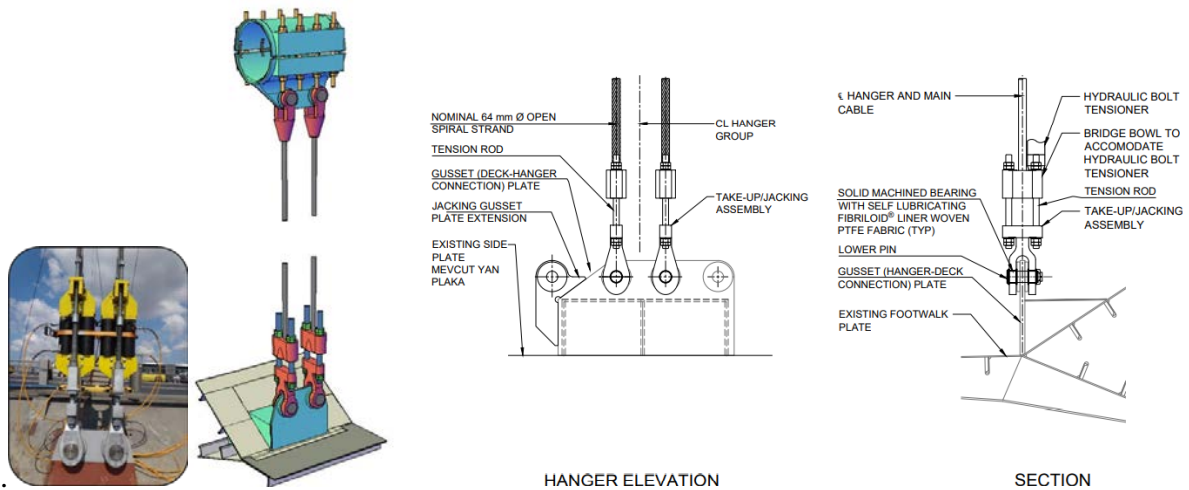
New Hanger details similar to the first Bosphorus Bridge with new built-in provision for length and tension adjustment
